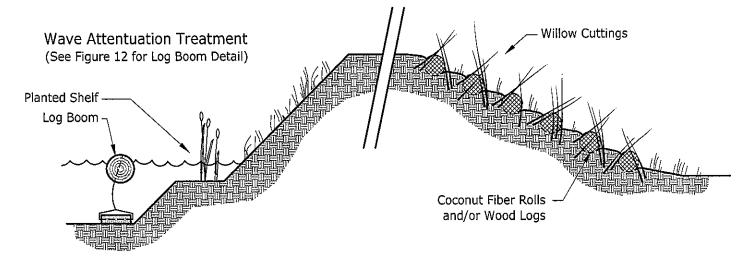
Typical Levee Repair Cross Section - South and East Levees
